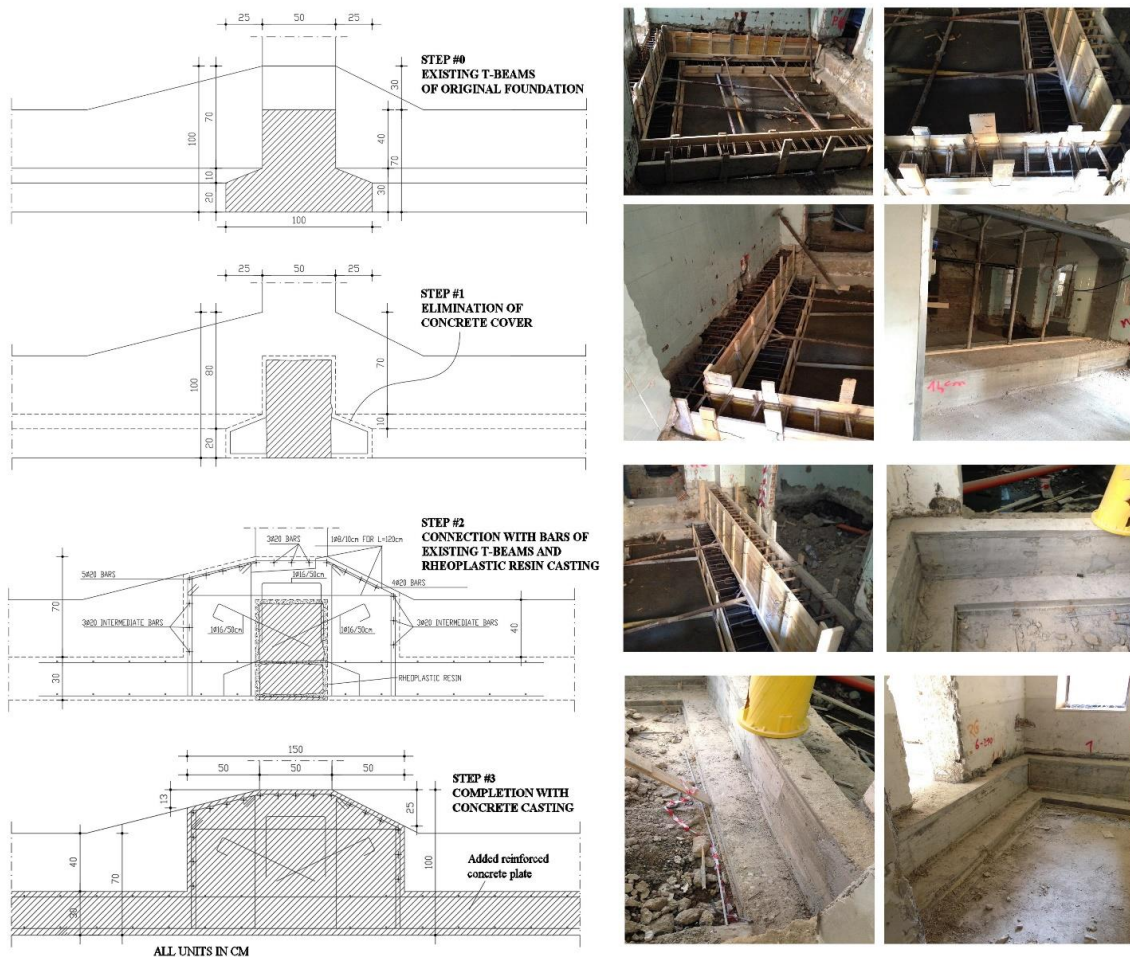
Retrofitting of foundation: design drawings (left) and photographs taken in situ (right)
